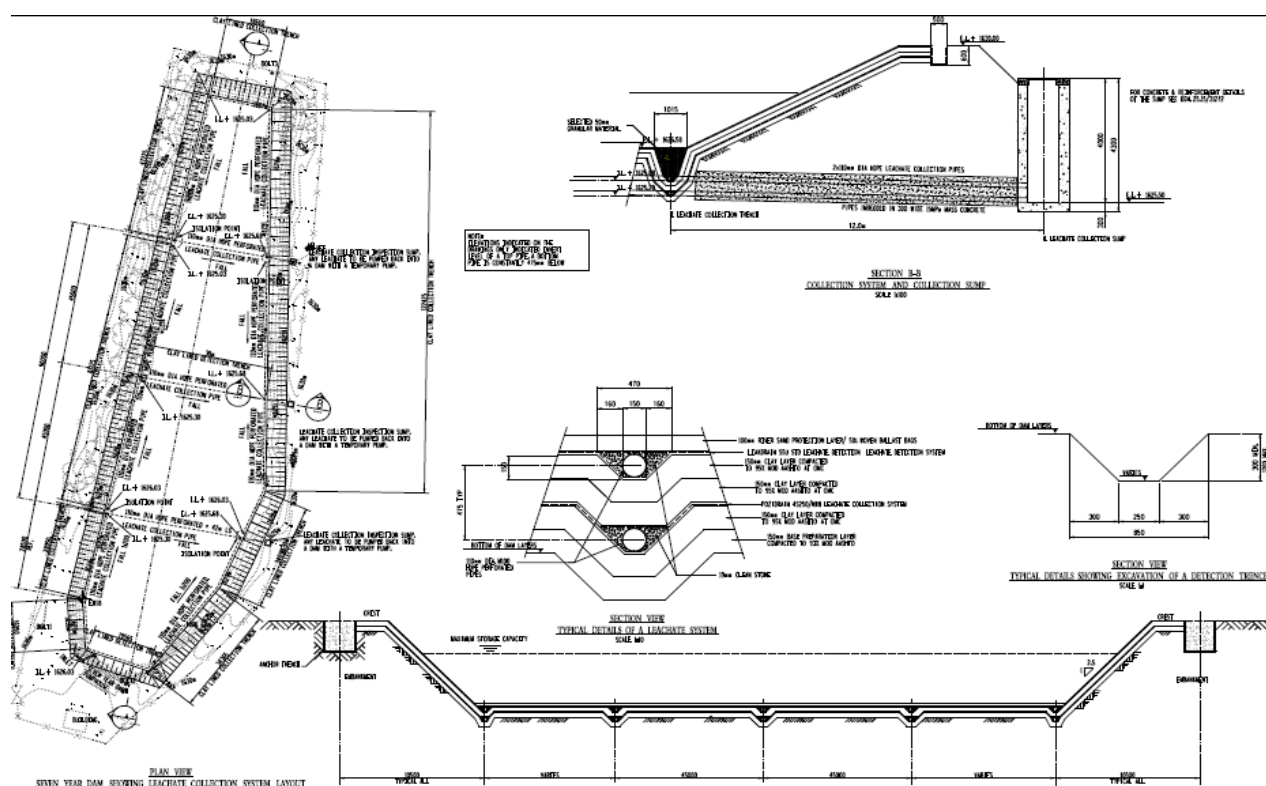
Seven-year dam Leak Detection System, Detail Design (MSHAWENIØØ1)
